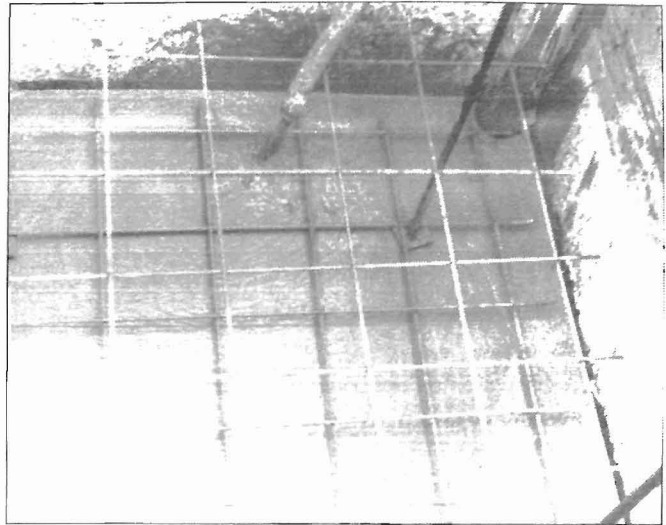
Start of lightweight concrete filling of shaft. Note bottom rebar cages.
